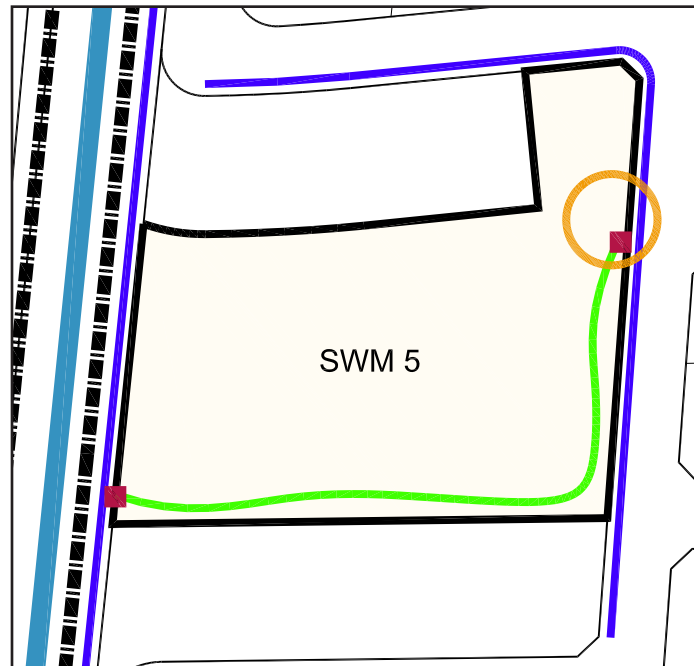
SWM Pond #5 Facility Fit Concept (1.03ha./2.00ac.)
